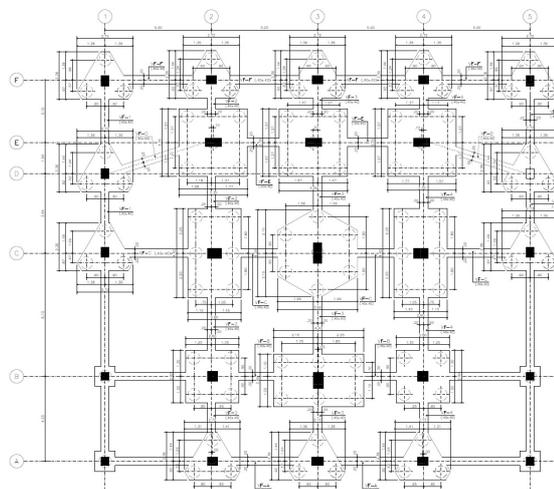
Foundation plan of the building shown in Figures 4a and b.
